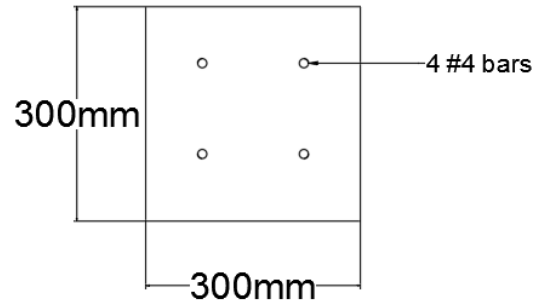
Beam rod detailing for Y-axis ROOF
